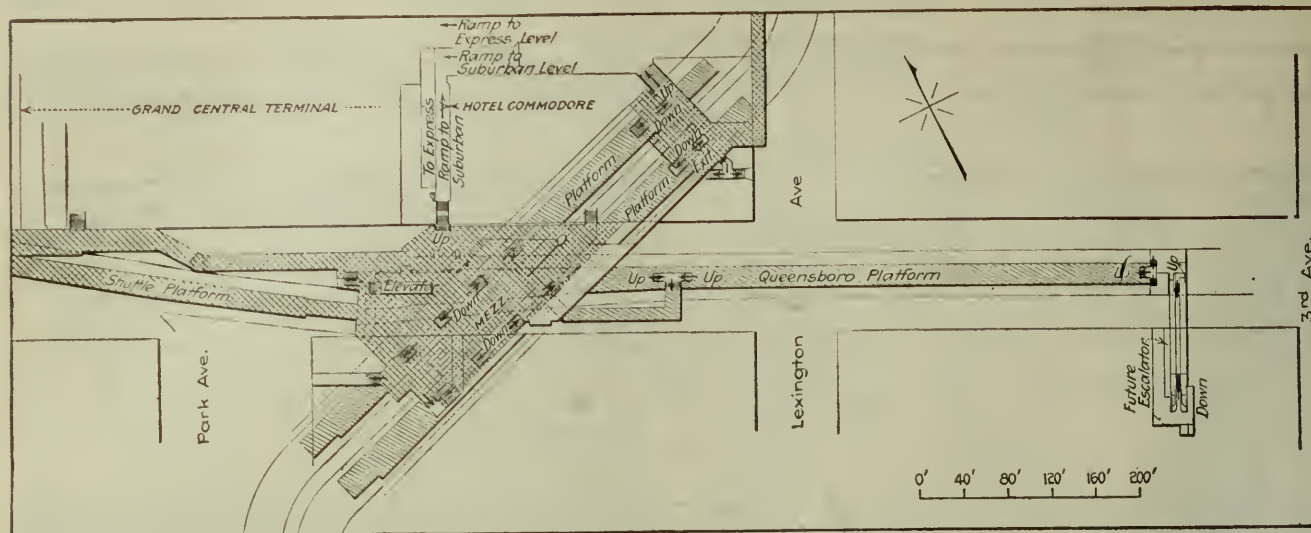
GRAND CENTRAL SUBWAY STATION, NEW YORK
